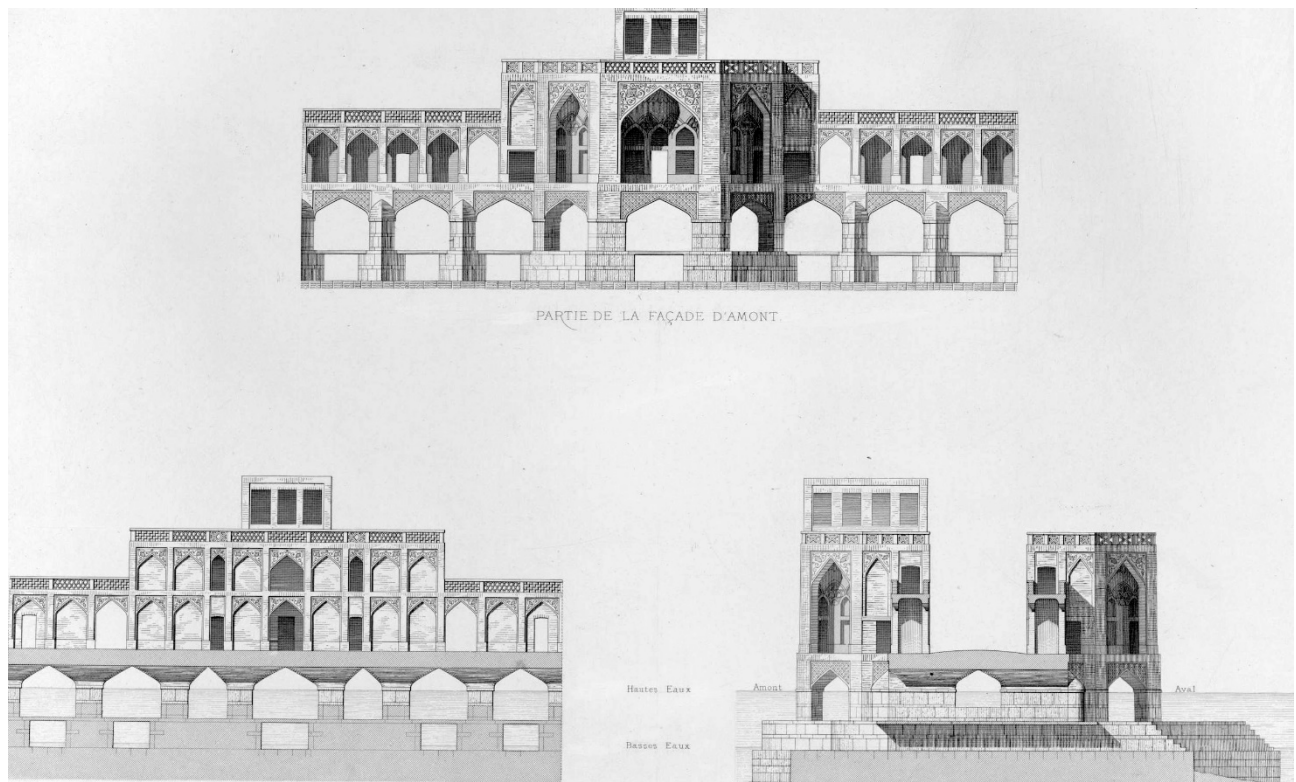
Khaju Bridge, Plan and Section by Coste. (Source: Wikimedia.org)
